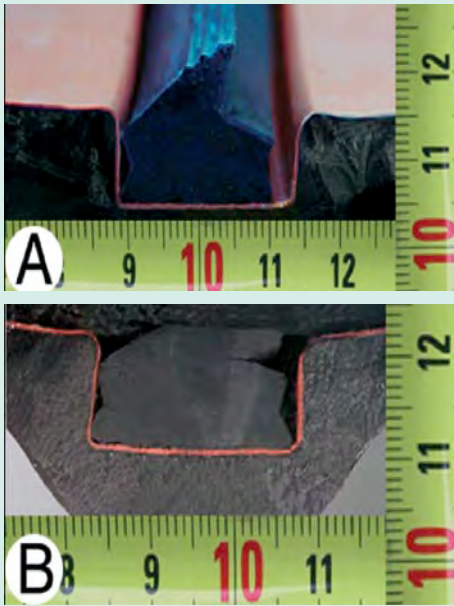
Example for a sliced joint. Socket and seal of a pipe (A). Compressed seal between socket and spigot (B).
